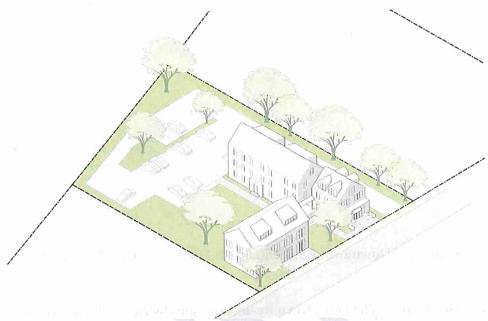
Willow Street Mixed-Use Sub-District Vision Illustration
